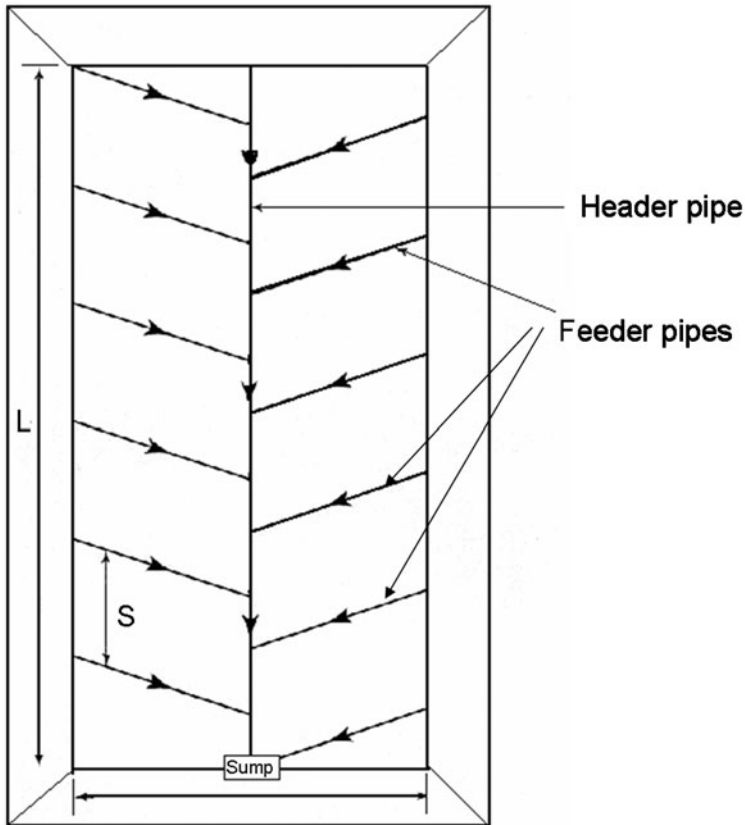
Plan View of a Possible Removal Pipe Scheme in a Primary Leachate Collection and Removal System.
